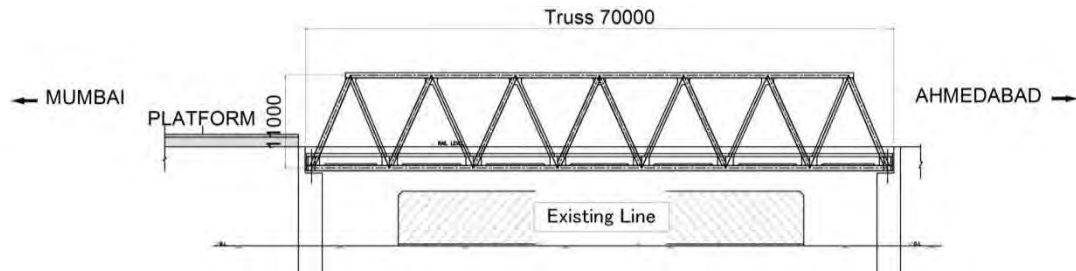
Structure at Crossing with Existing Lines (Alternative)
